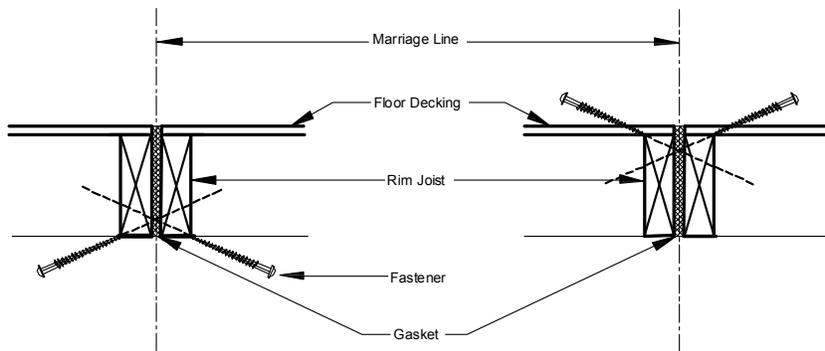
Floor connection through bottom board or floor decking (Fasteners must penetrate the rim joist by a minimum of 1 1/2 inches)
